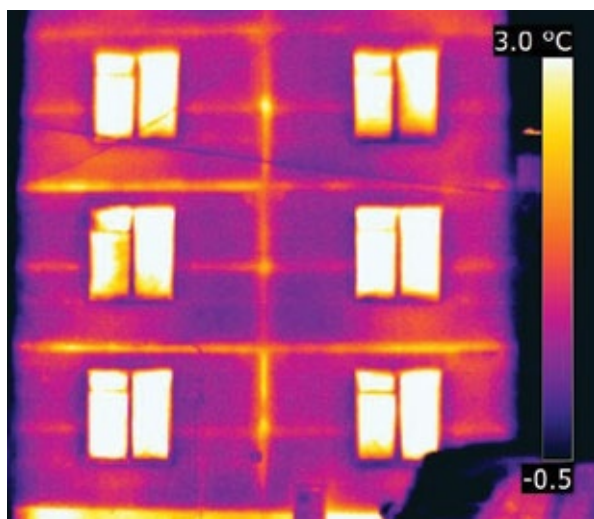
Heat loss on the corner of this brick building is intense at the junction of balcony glazing and the wall, and also where ceilings meet the walls.
